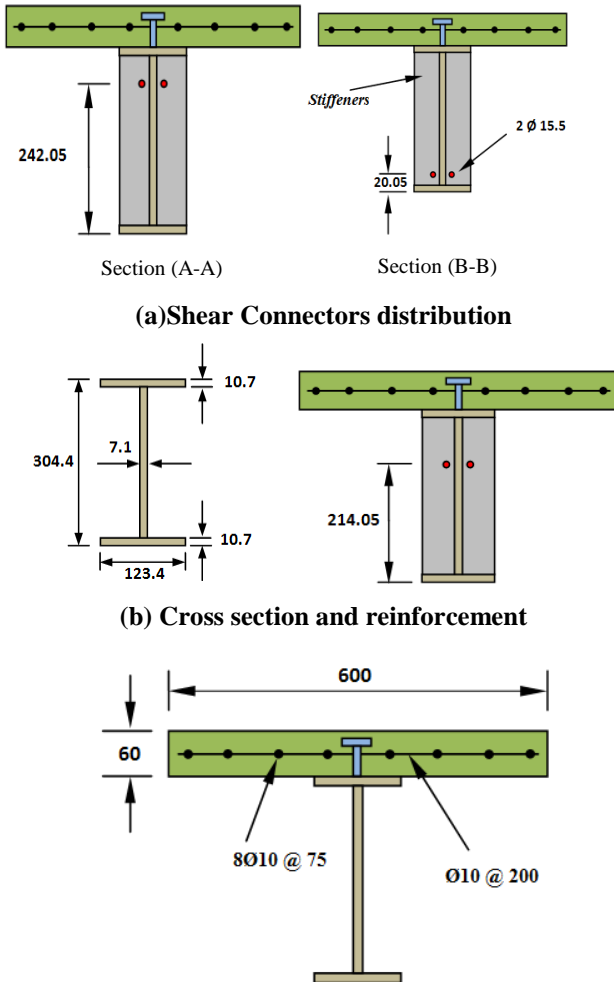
Details of Beam (C-BEAM) (all dimension in mm)
